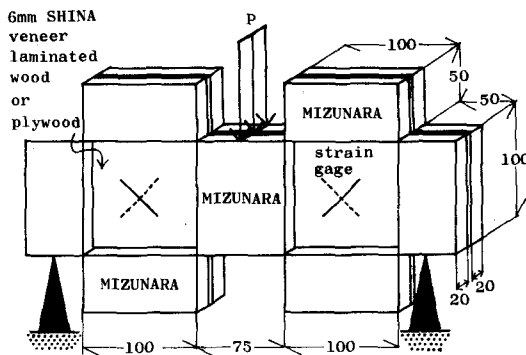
Panel shear test specimen of veneer laminated wood or plywood. (unit: mm)
